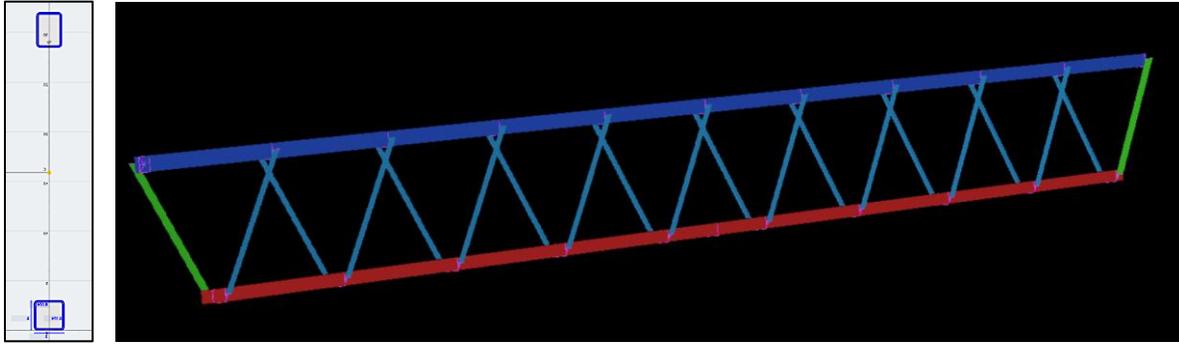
Hybrid 1 Design chord cross-section and joist rendering, respectively
